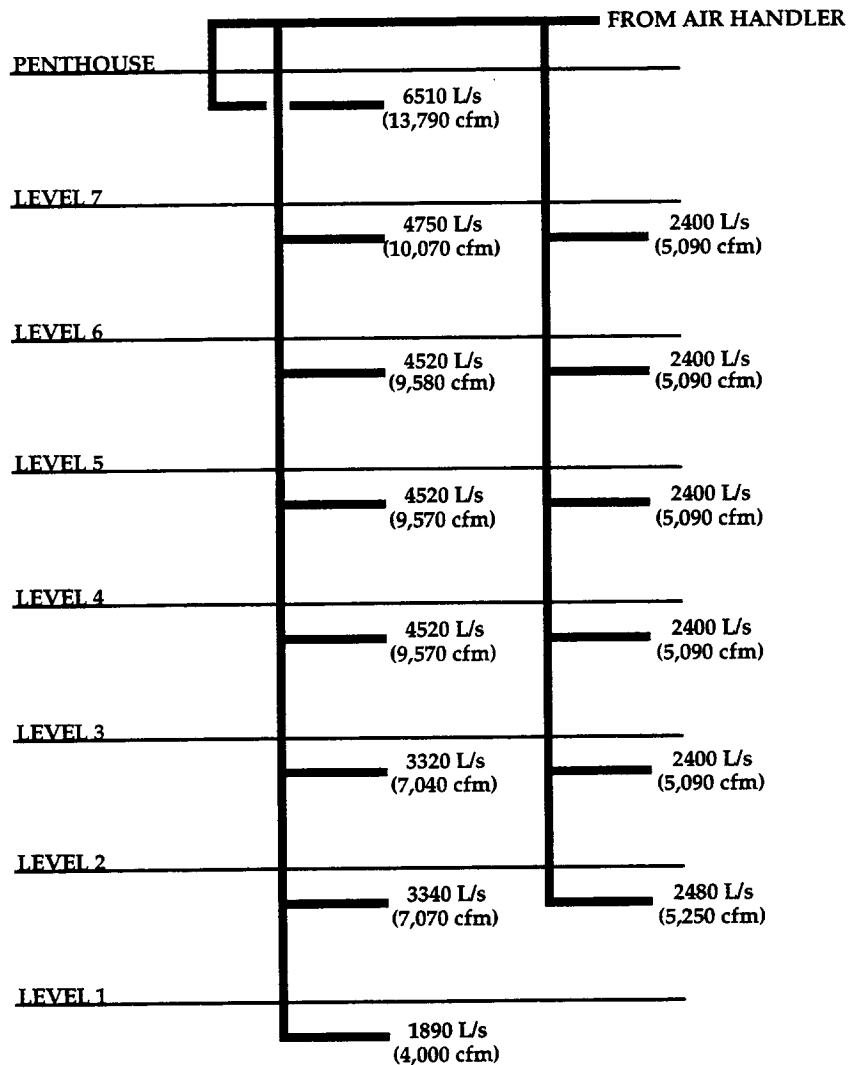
Example of Mechanical Drawing - Riser Diagram
